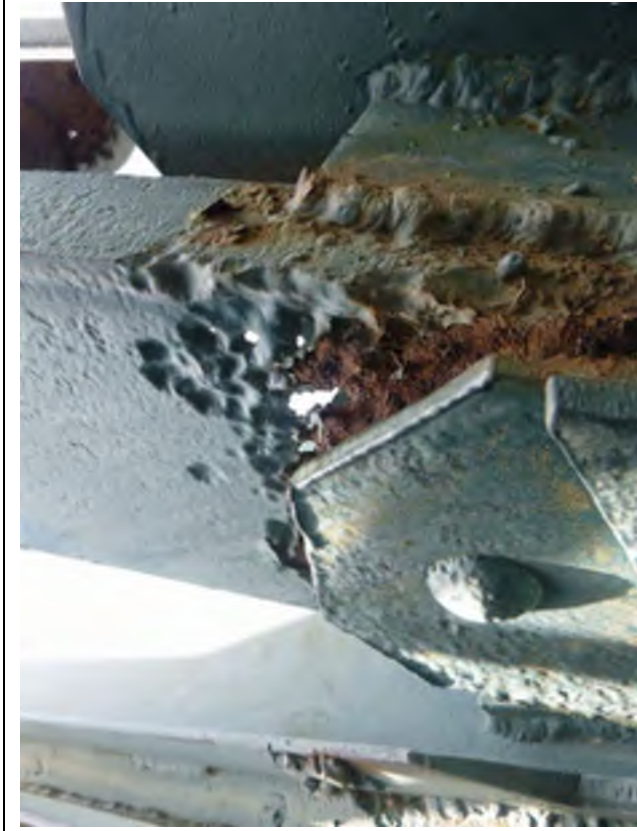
Section loss in diagonal member L7-U8 at L7 on south side of North Truss. Note the repair plate.
